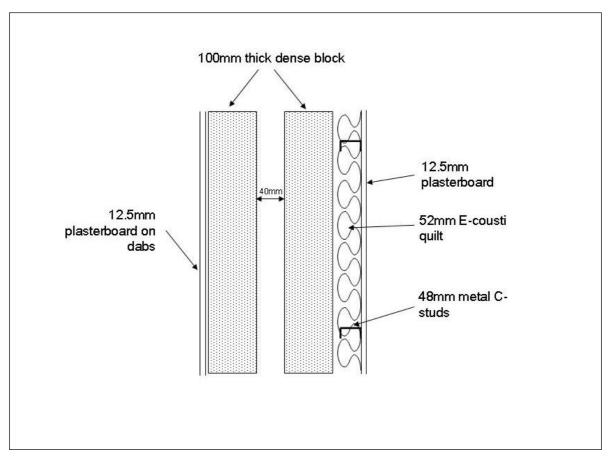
Separating wall construction between adjacent dwellings at 115 Llandudno Road, Colwyn Bay
